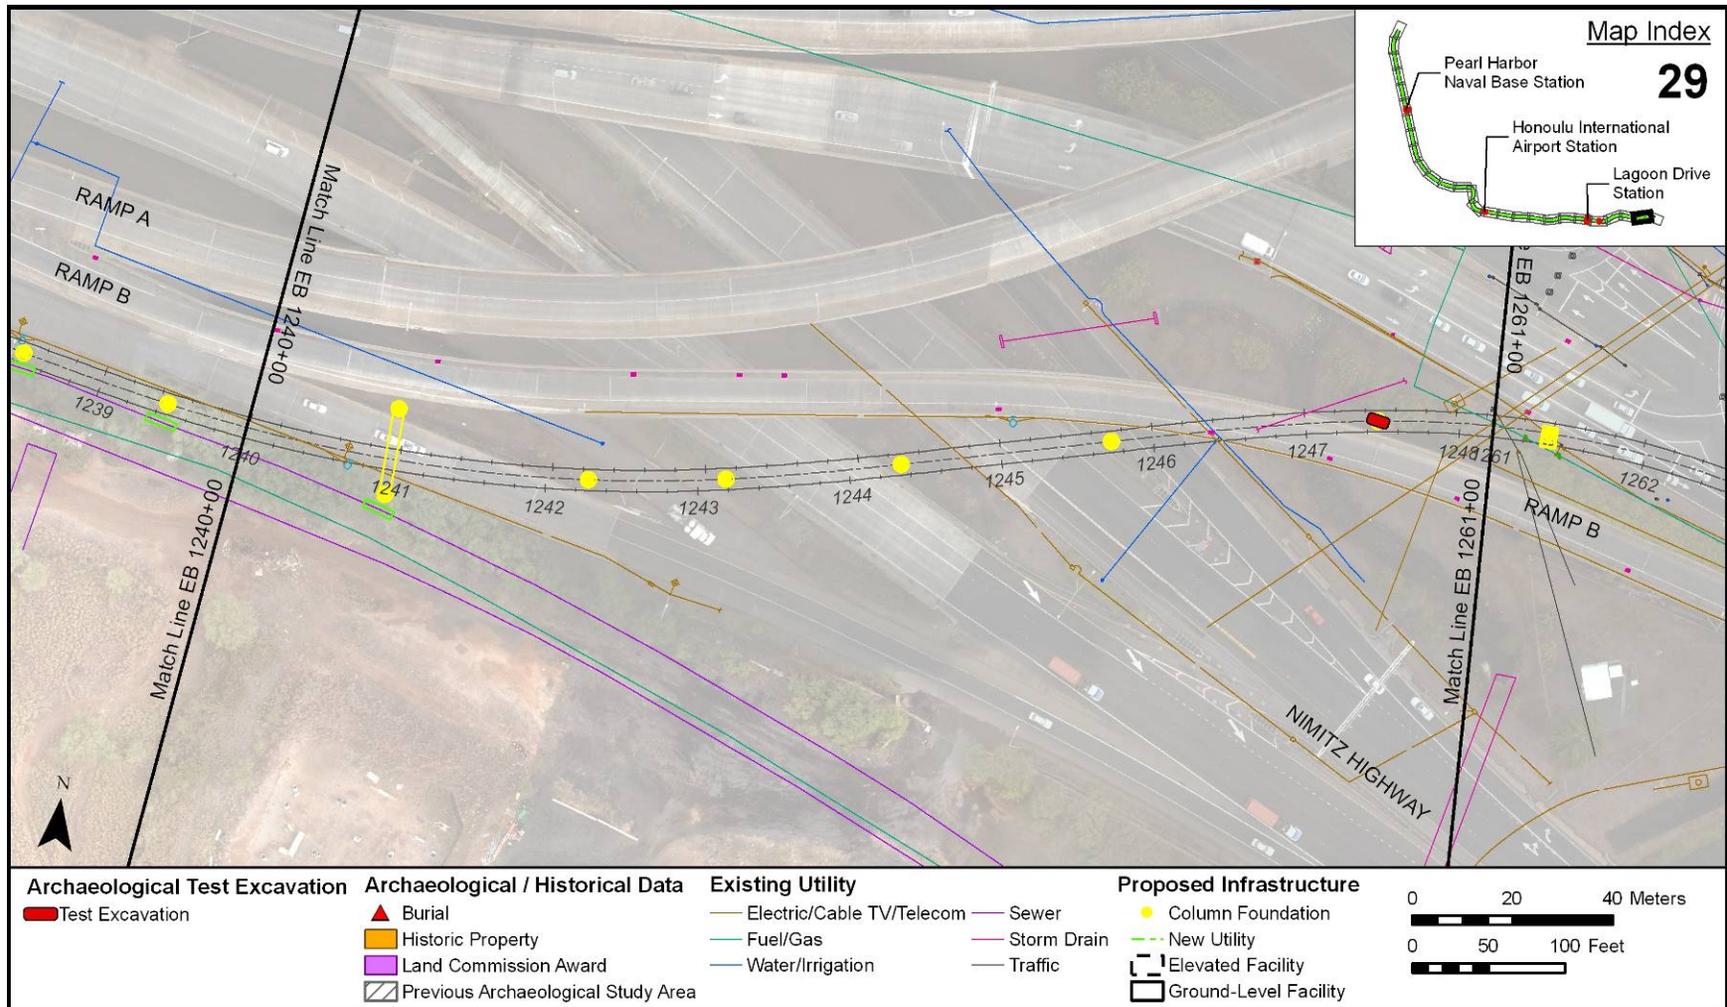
Map Sheet J 29, one 10x3 excavation at column foundation @ 1247+50
